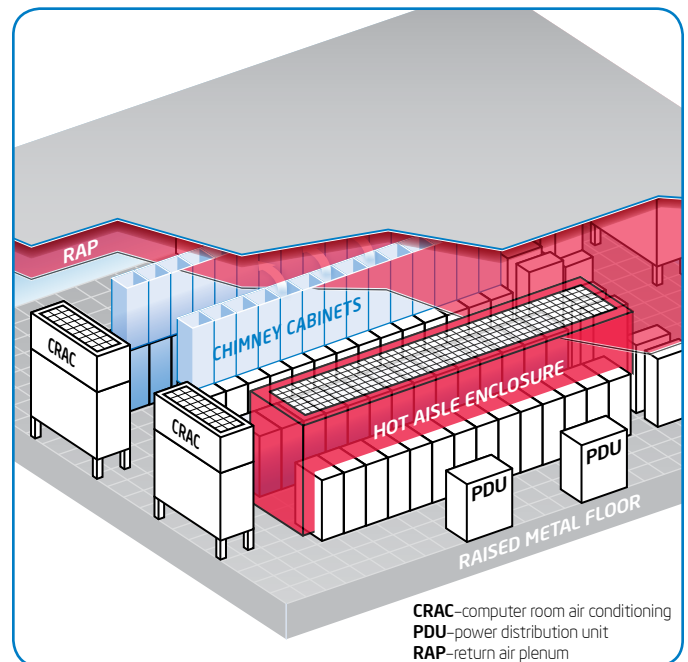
For rooms with a raised metal floor (RMF), we raise the room air handlers’ supply path above the RMF to achieve a flooded supply air design used in conjunction with chimney cabinets or hot aisle enclosures.
